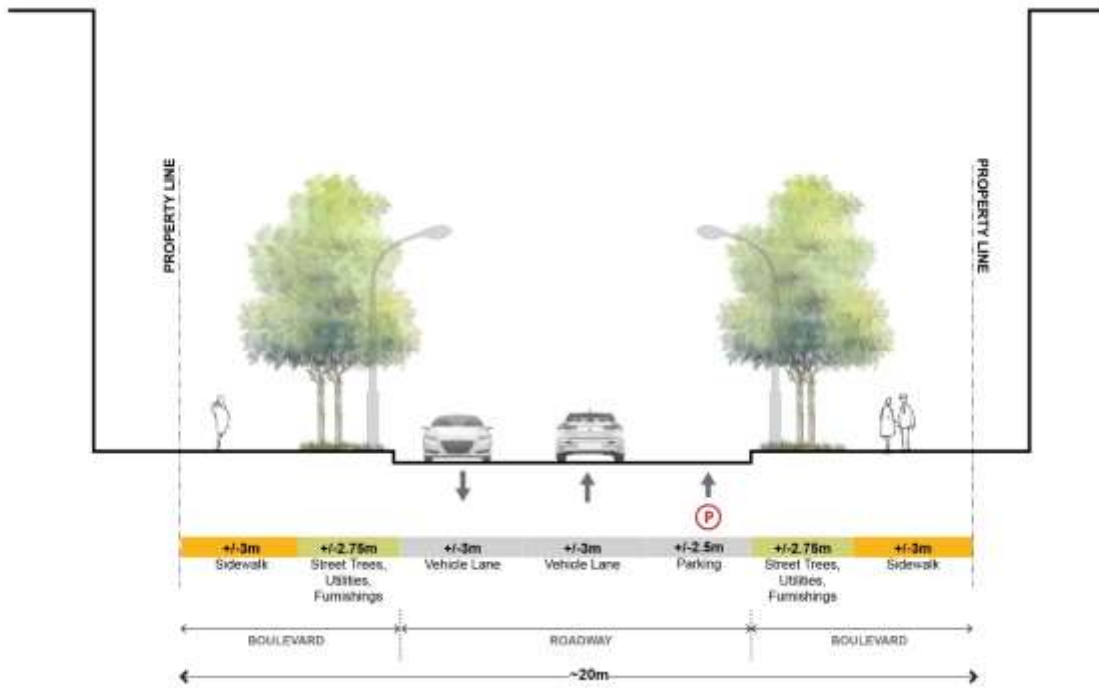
Local Road Typical Cross-section for Roadways with Parking, 20 metre ROW
